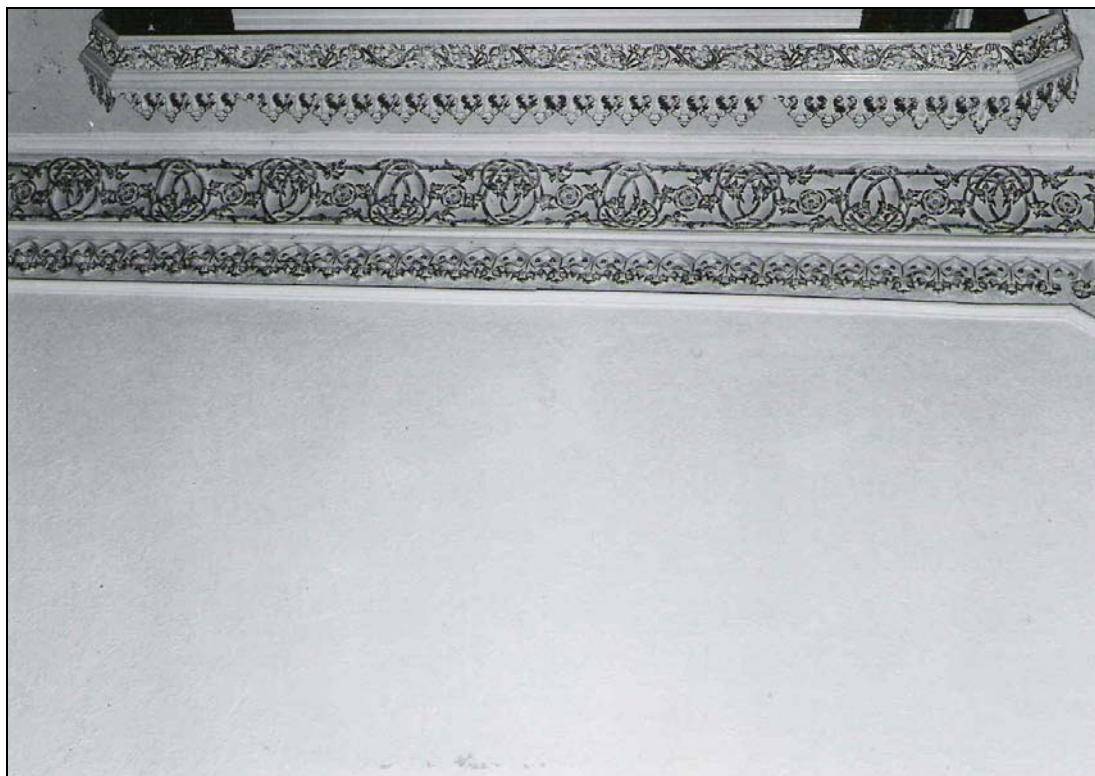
Moulded plaster freeze, cornice and pelmet to window in drawing room
